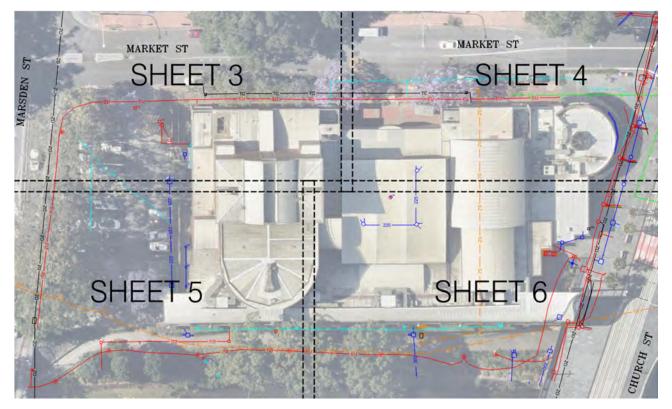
Excerpt of sub-surface utility plan (Source: Veris)
